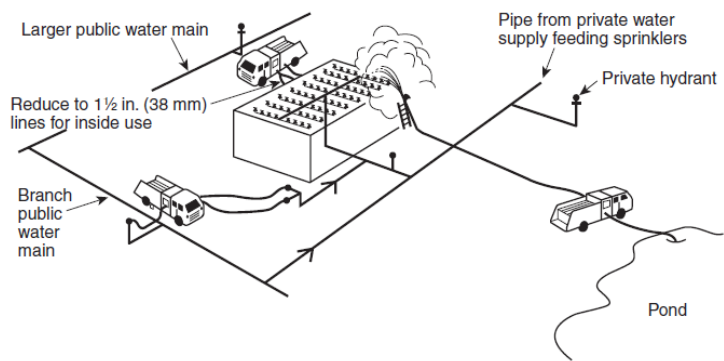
Fire Department Water Supply Connections to Sprinkler System.
